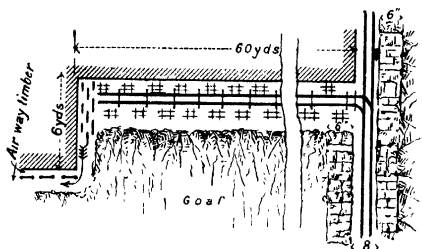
TIMBERING IN MODIFIED LONGWALL WORKING.
